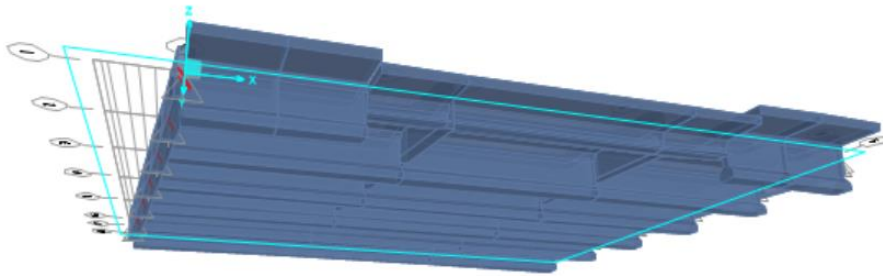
Finite Elements model simulating the damaged girder (Severe Damage)
